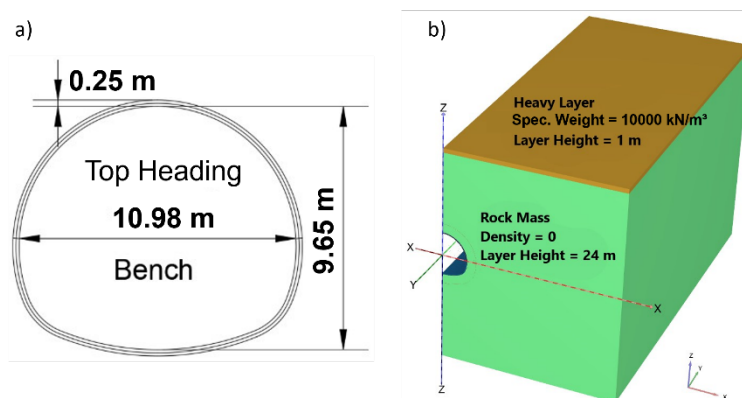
a) Dimensions of the tunnel cross section and b) 3-D model overview.
